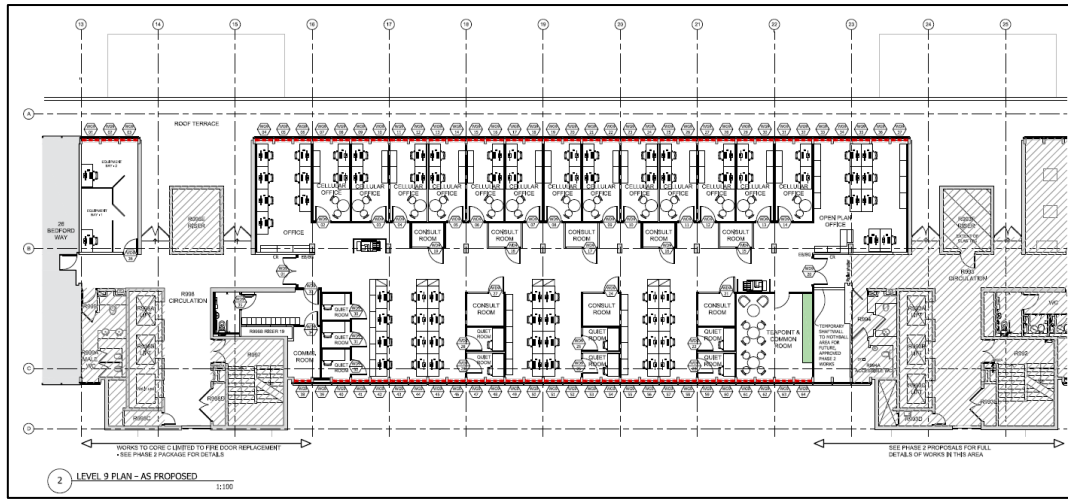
Proposed Floor Plan (Source: Architon LLP, drawing ref. 3147-WS2-0905 P2)
